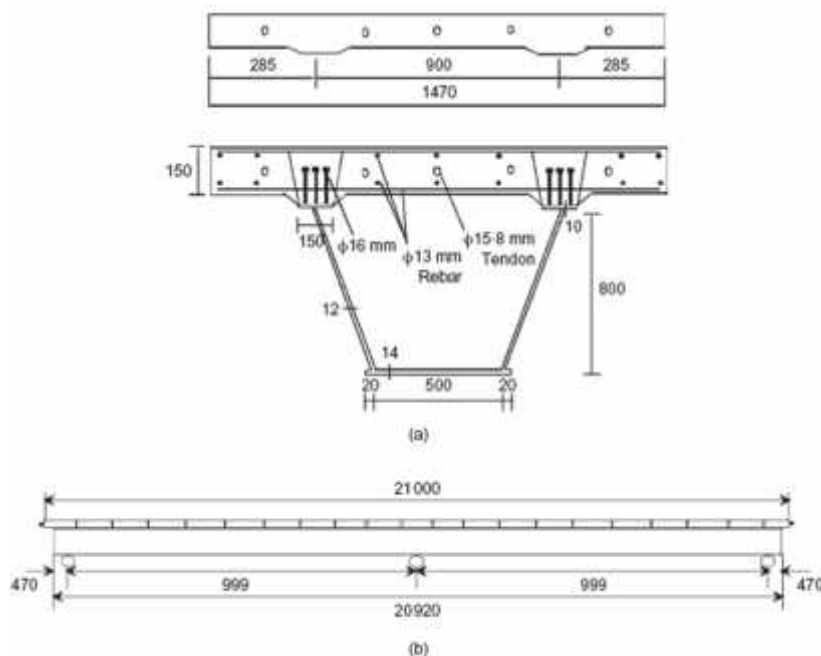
Continuous bridge model: (a) cross-section; (b) elevation (dimensions in mm)
